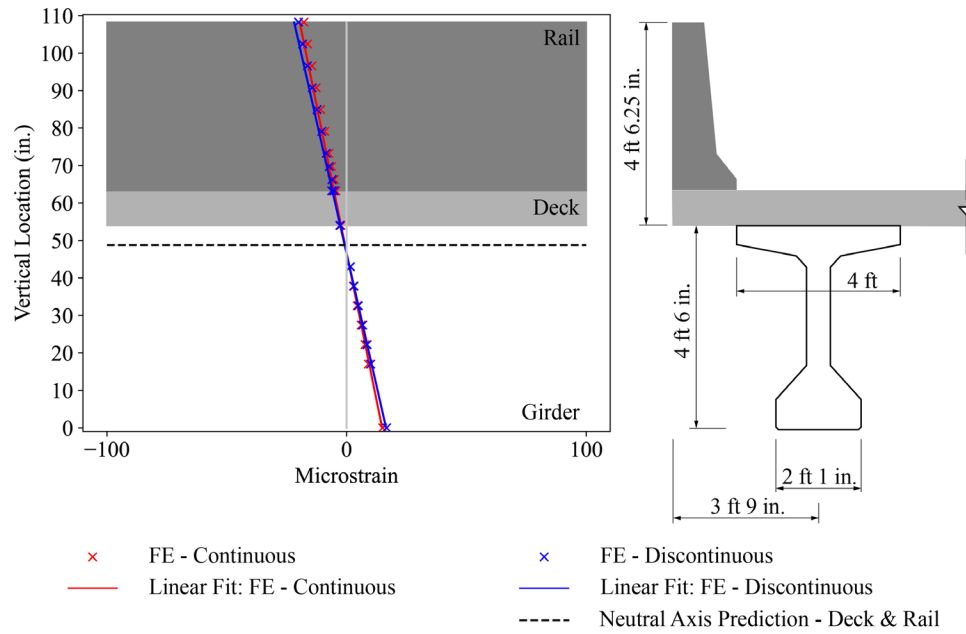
Effect of rail discontinuity for three-span continuous prestressed concrete girder bridge with FT rail: FE predictions for strains at peak positive moment location.
